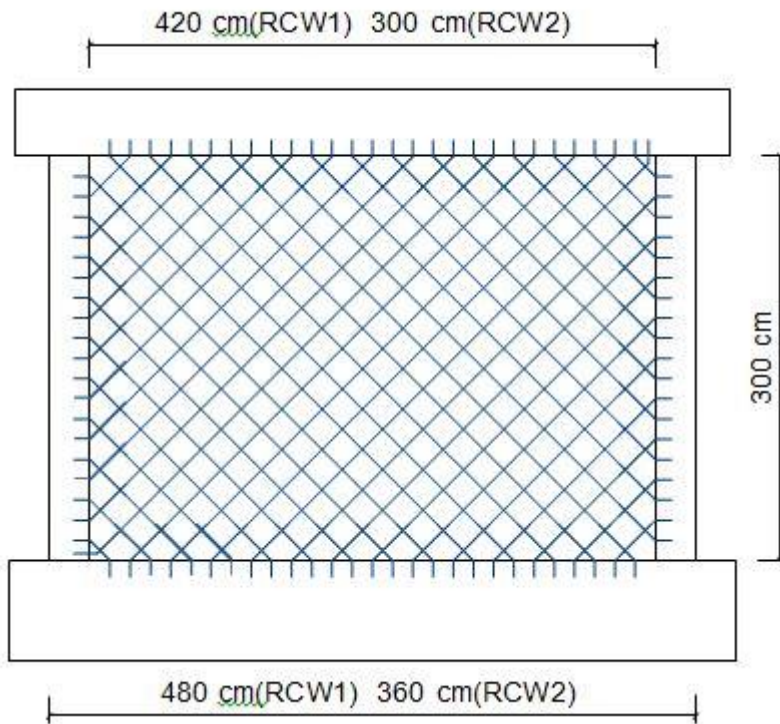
RC frame and the reinforcement arrangement of the post-installed wall of RCW1
